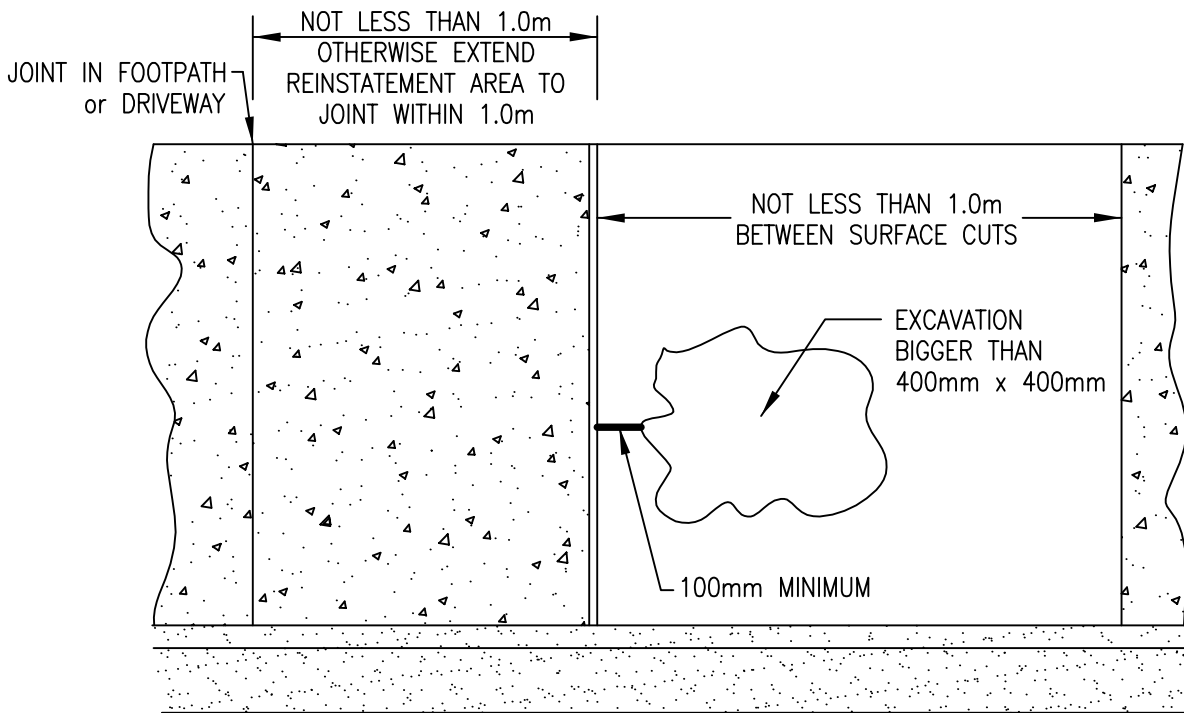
REINSTATEMENT OF CONCRETE PATH OR DRIVEWAY
